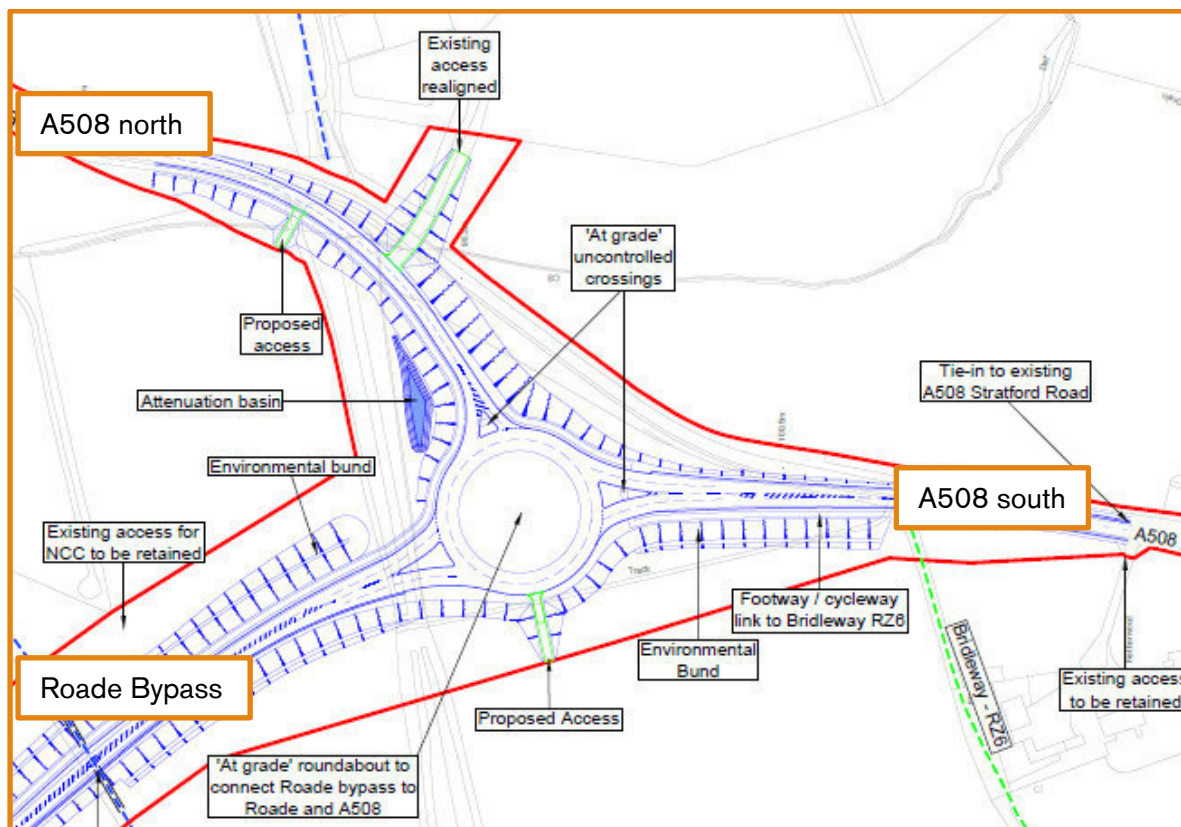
A508 Stratford Road/Roade Bypass 3-arm roundabout
